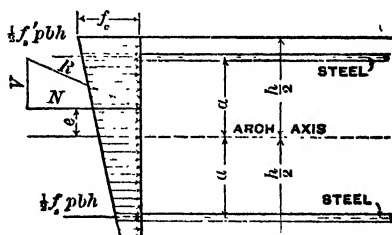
Stresses Caused by a Force Producing Compression upon the Whole Reinforced Section. (See p. 565.)
